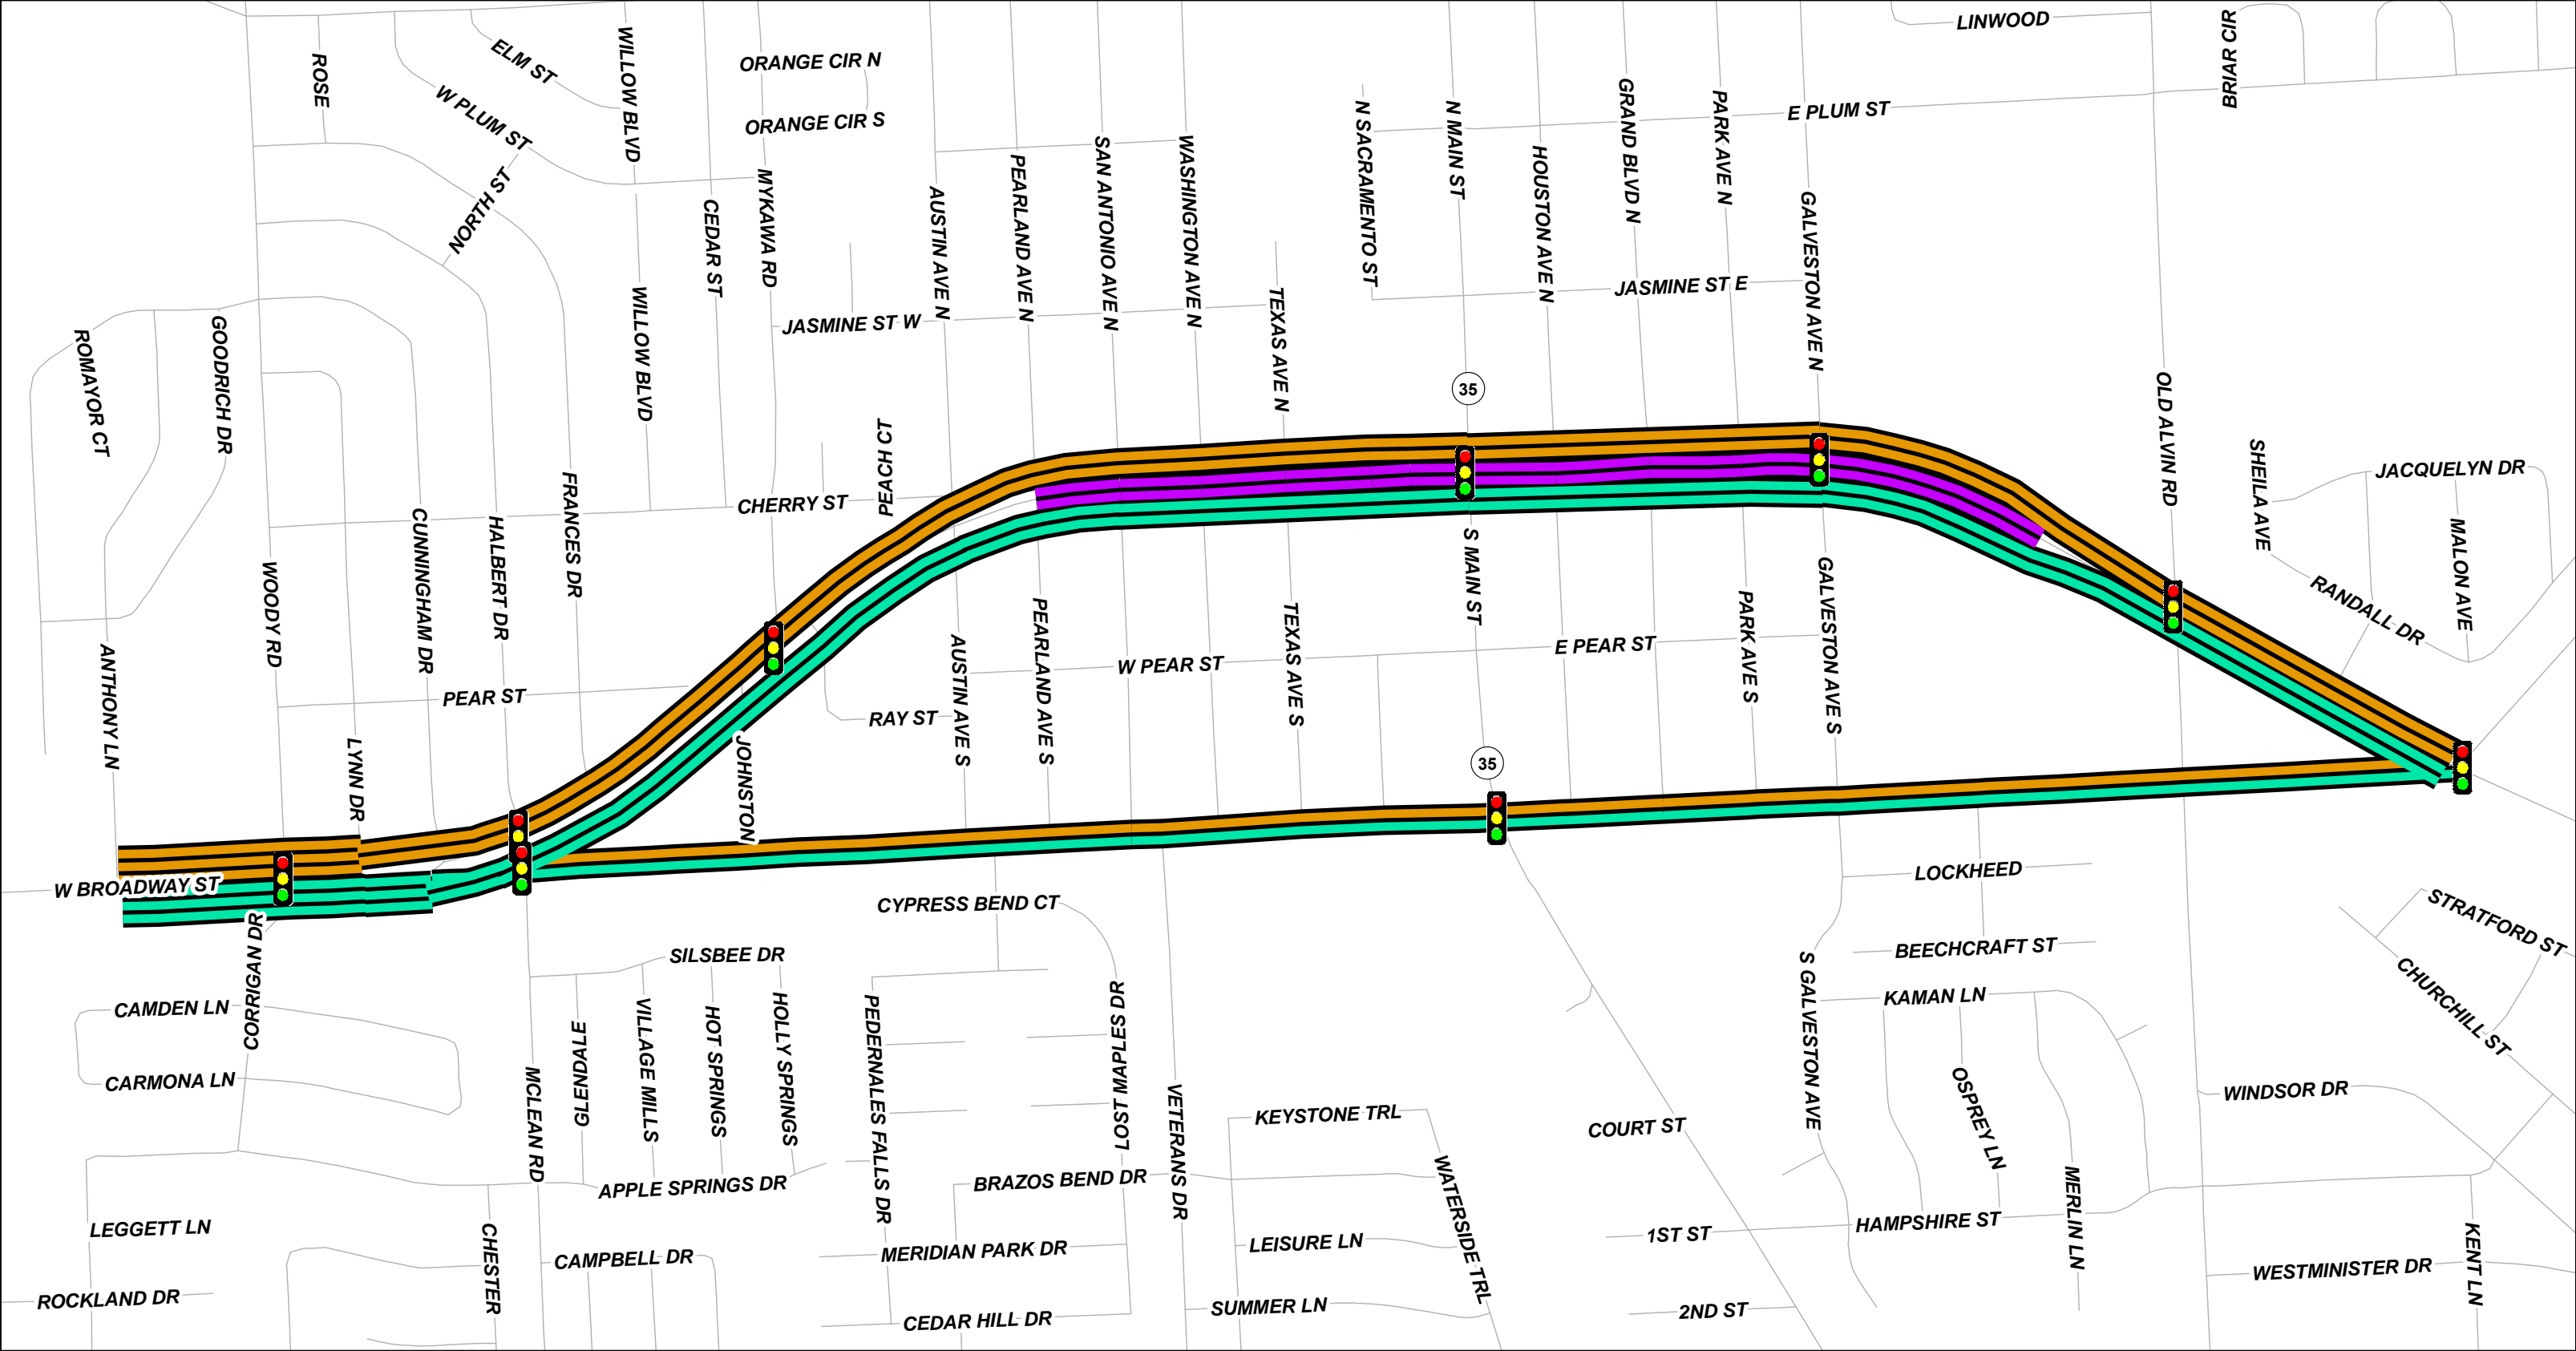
TWO-LANE ELEVATED BYPASS
